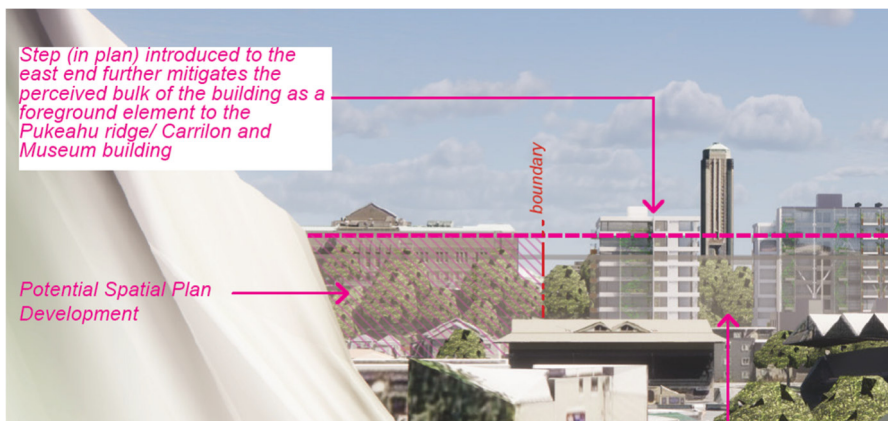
Building E modulation is apparent in views from the east (ADS Appendix 1)
